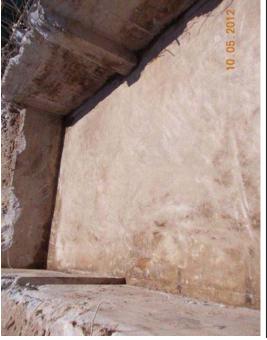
The Base and Walls of the Concrete Box Containment After Removal of the Three Kerosene Tanks.
